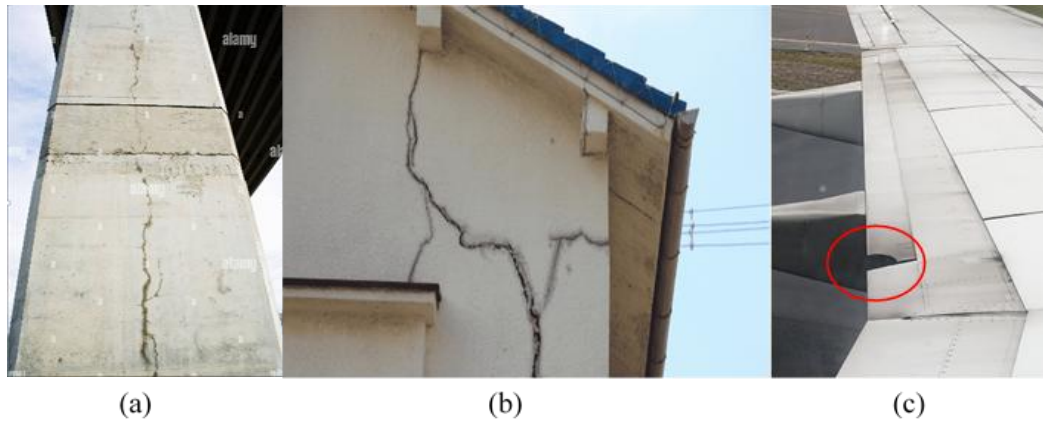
a) Crack in a pillar of a bridge [67] , b) Crack in house wall [68], and c) Crack in airplane wing [69].
